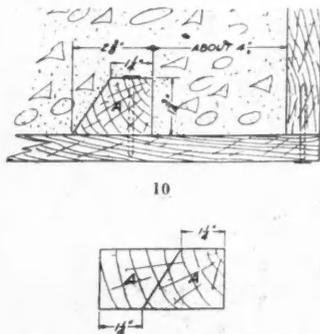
Detail of Concrete Lintel, Showing Wood Strip Inserted in the Form so that a Rebate Will Be Left on to Which the Top of the Steel Sash May Be Inserted.
